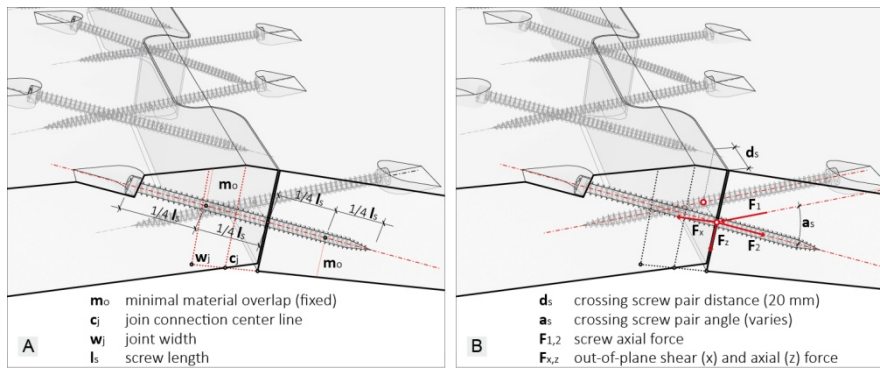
Visualization of the developed finger joint connection. Each finger joint includes a pair of parallel crossing screws, which intersect from the side view at the connection point between two plates. The crossing screws function as a small truss structure embedded in the plywood. Out-of plane shear F_x and axial force F_z are therefore taken by screw axial force F_1 and F_2 .
